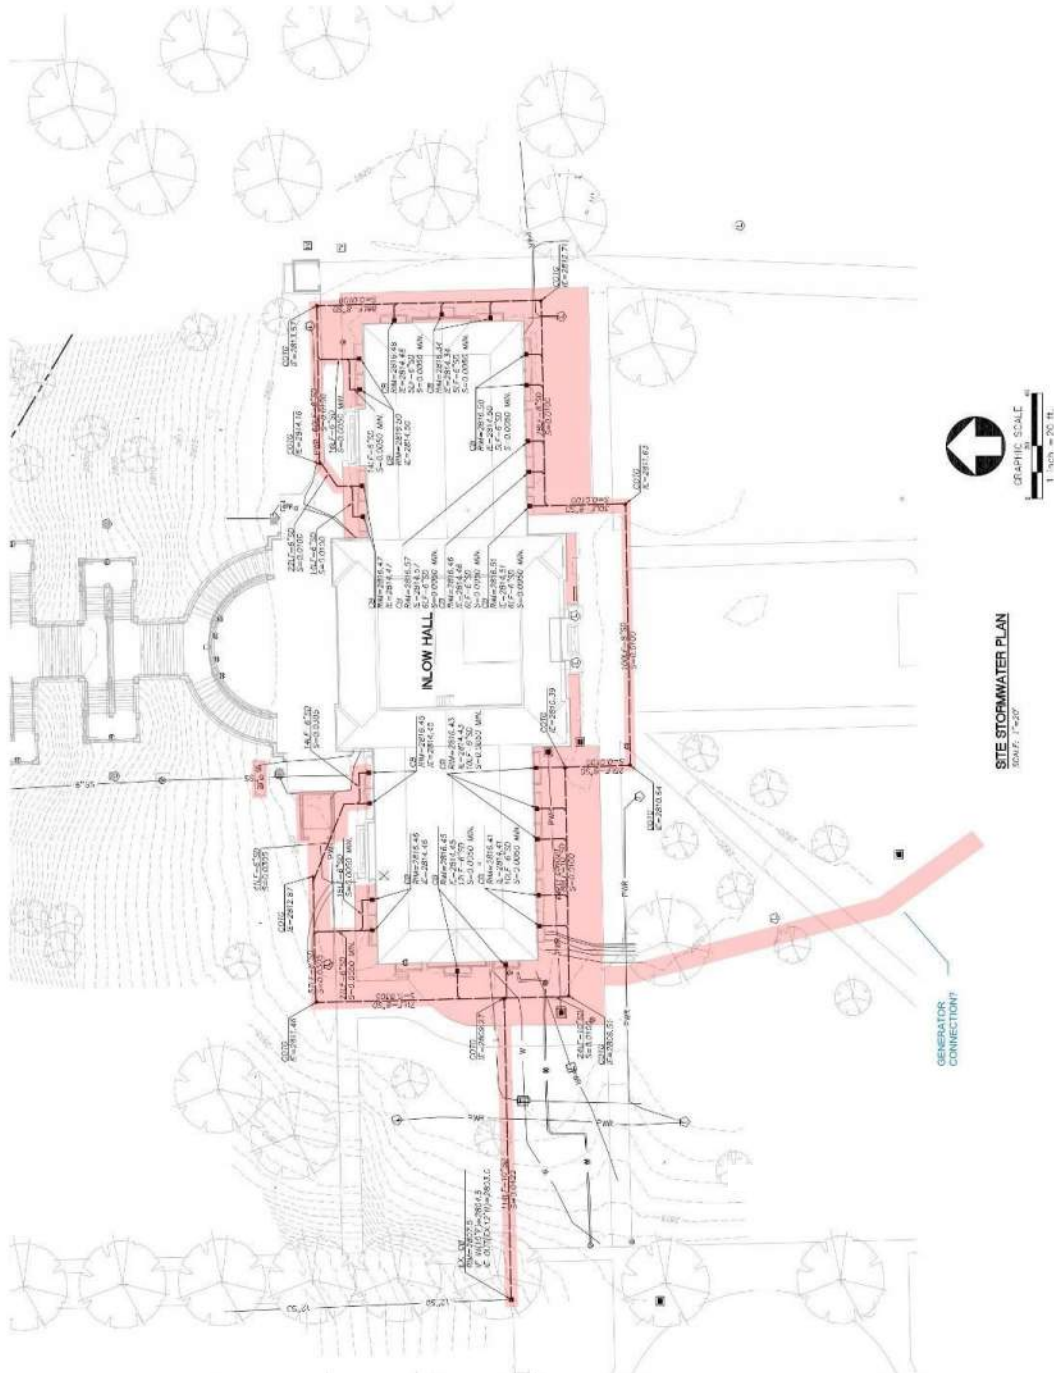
Inlow Hall Phase II proposed construction footprint (pale red shading) for utilities.
